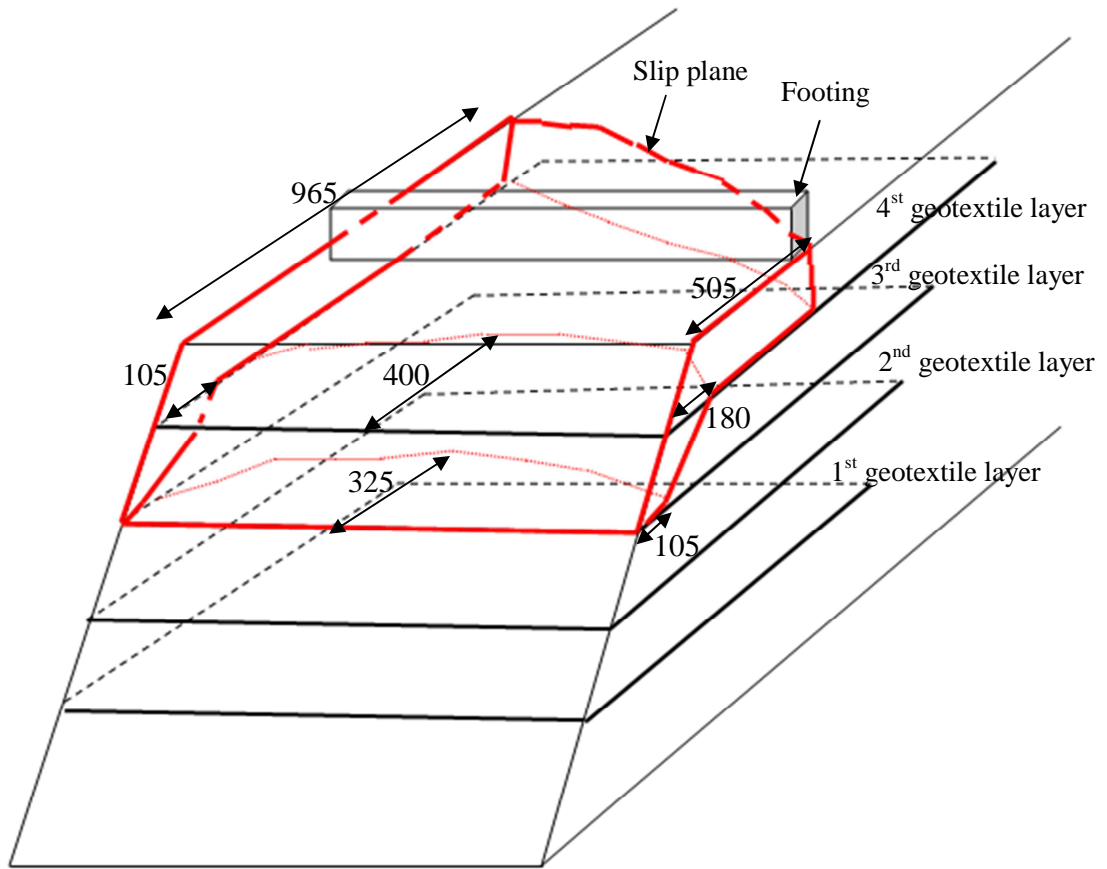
Failure plane geometry as traced after careful excavation of the failed block at the end of the test. Note: all dimensions are in “mm”.
